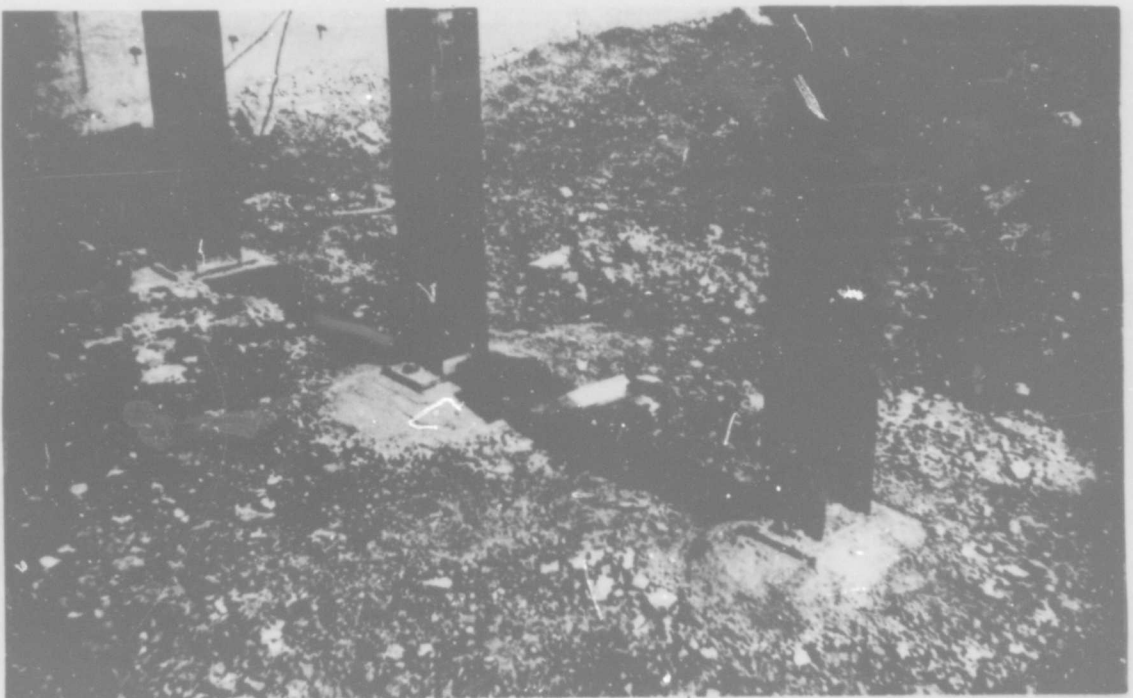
Overpressure Structure Columns Showing Anchor Bolts and Drypack.
